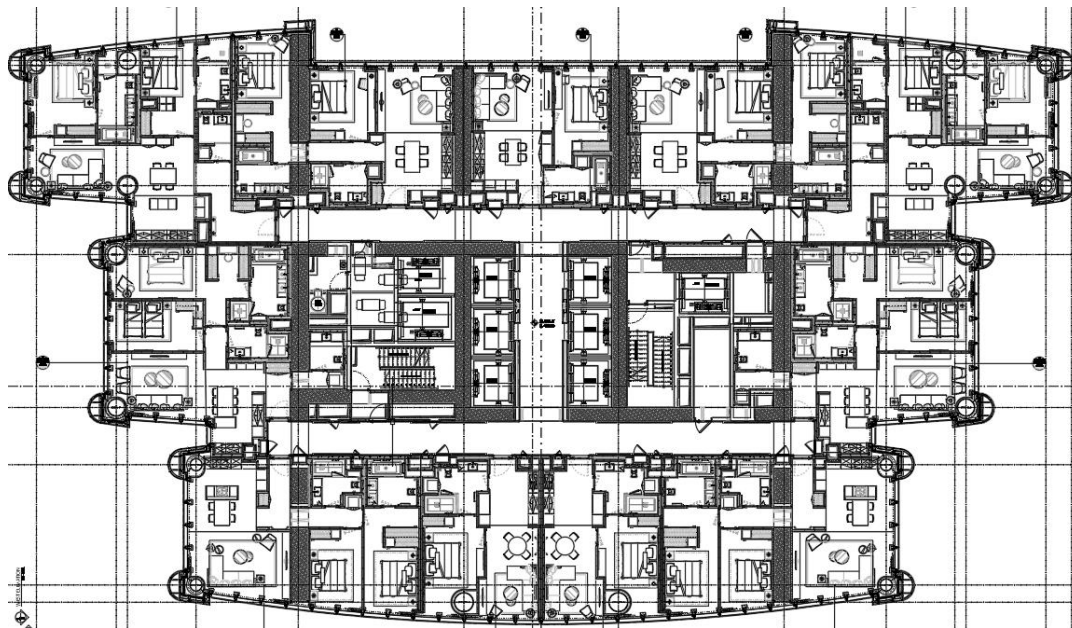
Architectural plan of floors 13 to 20 of Zone B.
